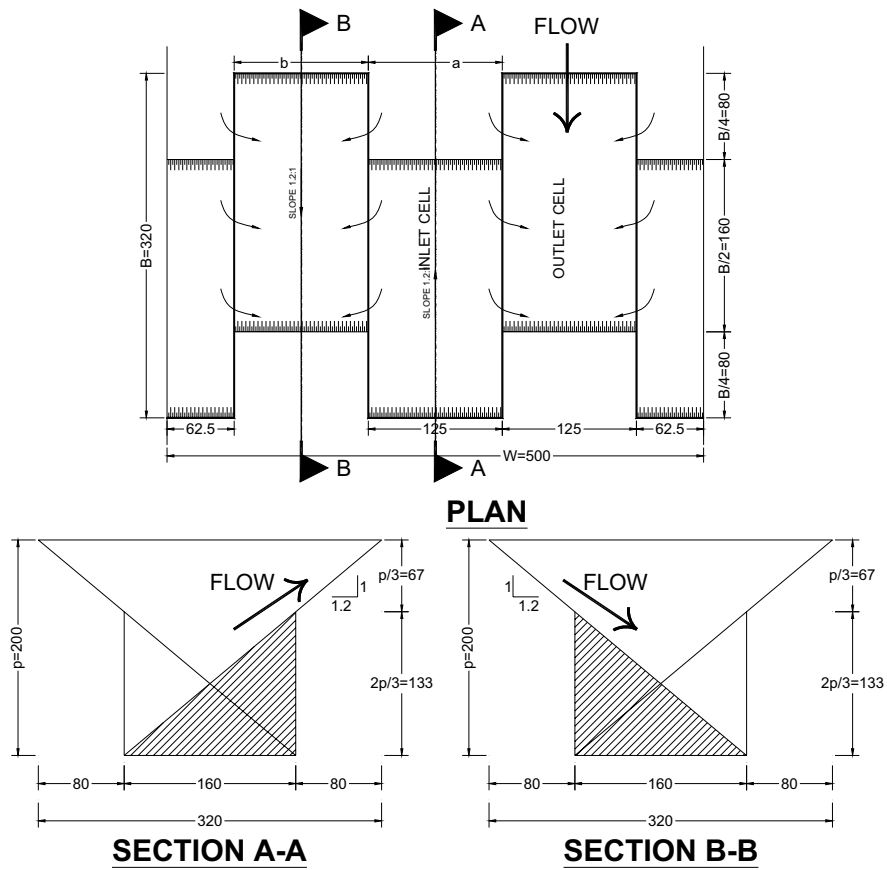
Plan and section of model P₂M₆ (both sides ramping), (dimensions in mm)
